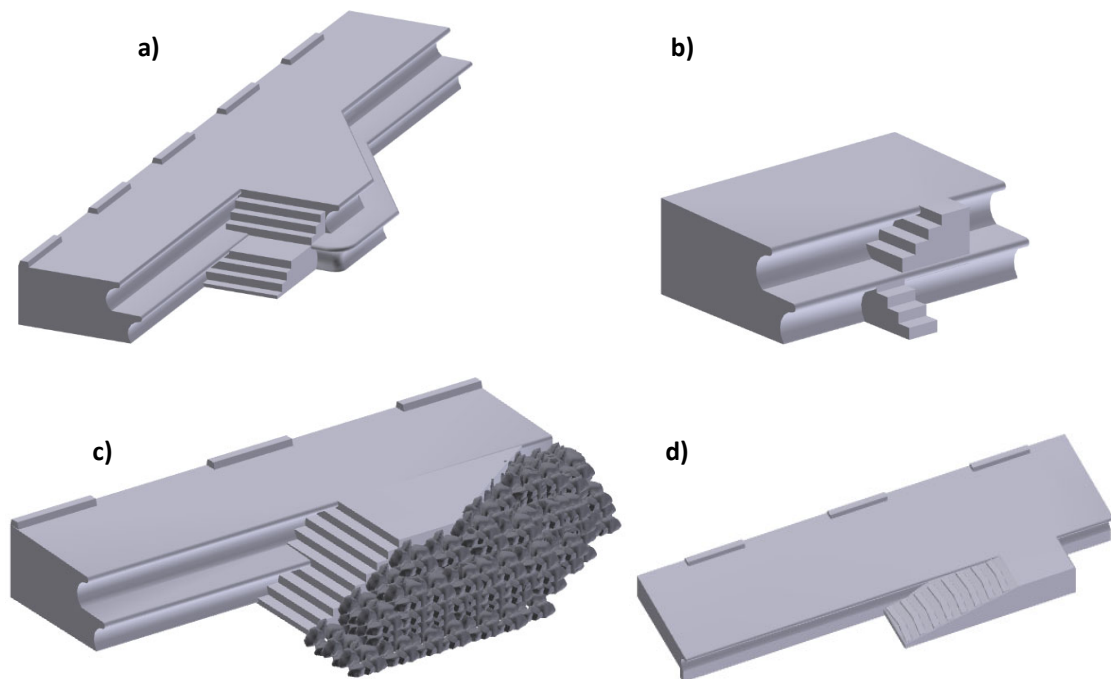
Beach access designs a) standard steps in double curved wall, b) mini steps in double curved wall, c) standard steps as transition between curved wall and revetment, and d) boat ramp access in single curved wall. [Source: Design Features Report (Stantec 2018b)].
